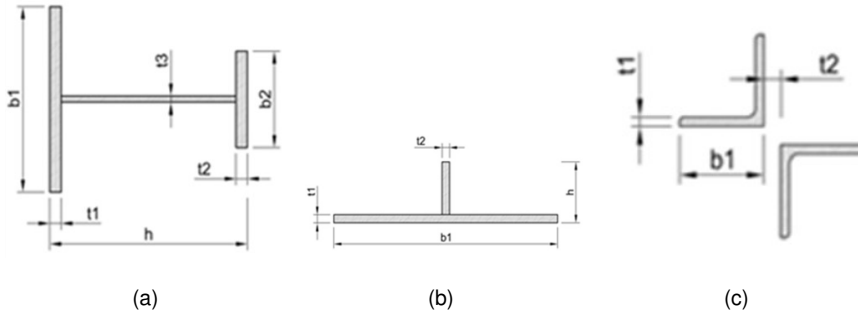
Deck member sections: a) upper chord; b) lower chord; c) diagonals, bracings, vertical braces and dividers.
